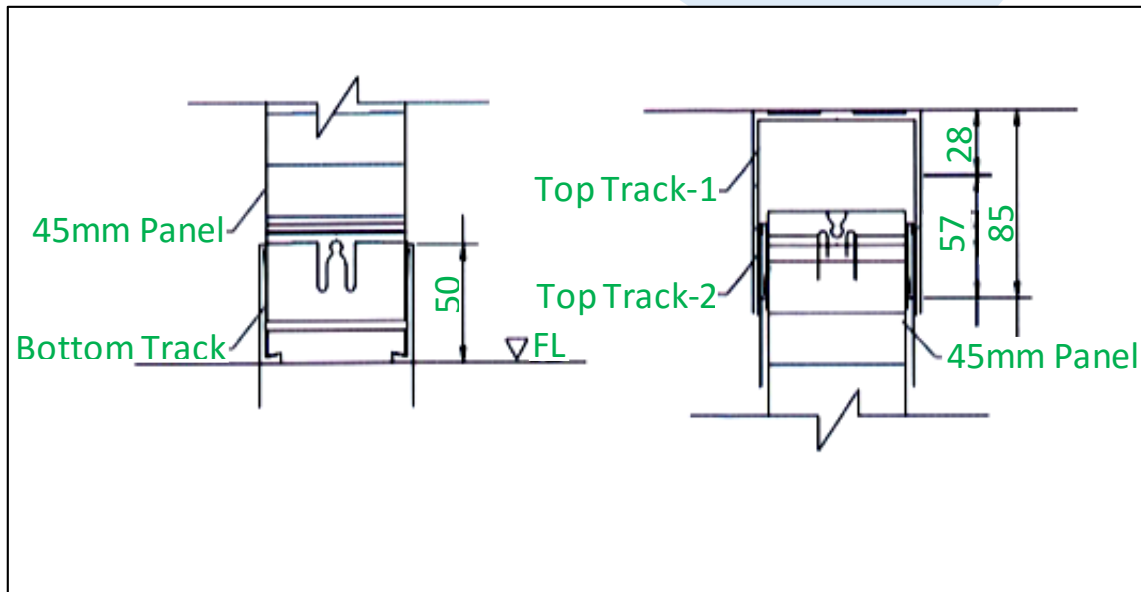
System Drawing (Internal)-Double Sided Wall
